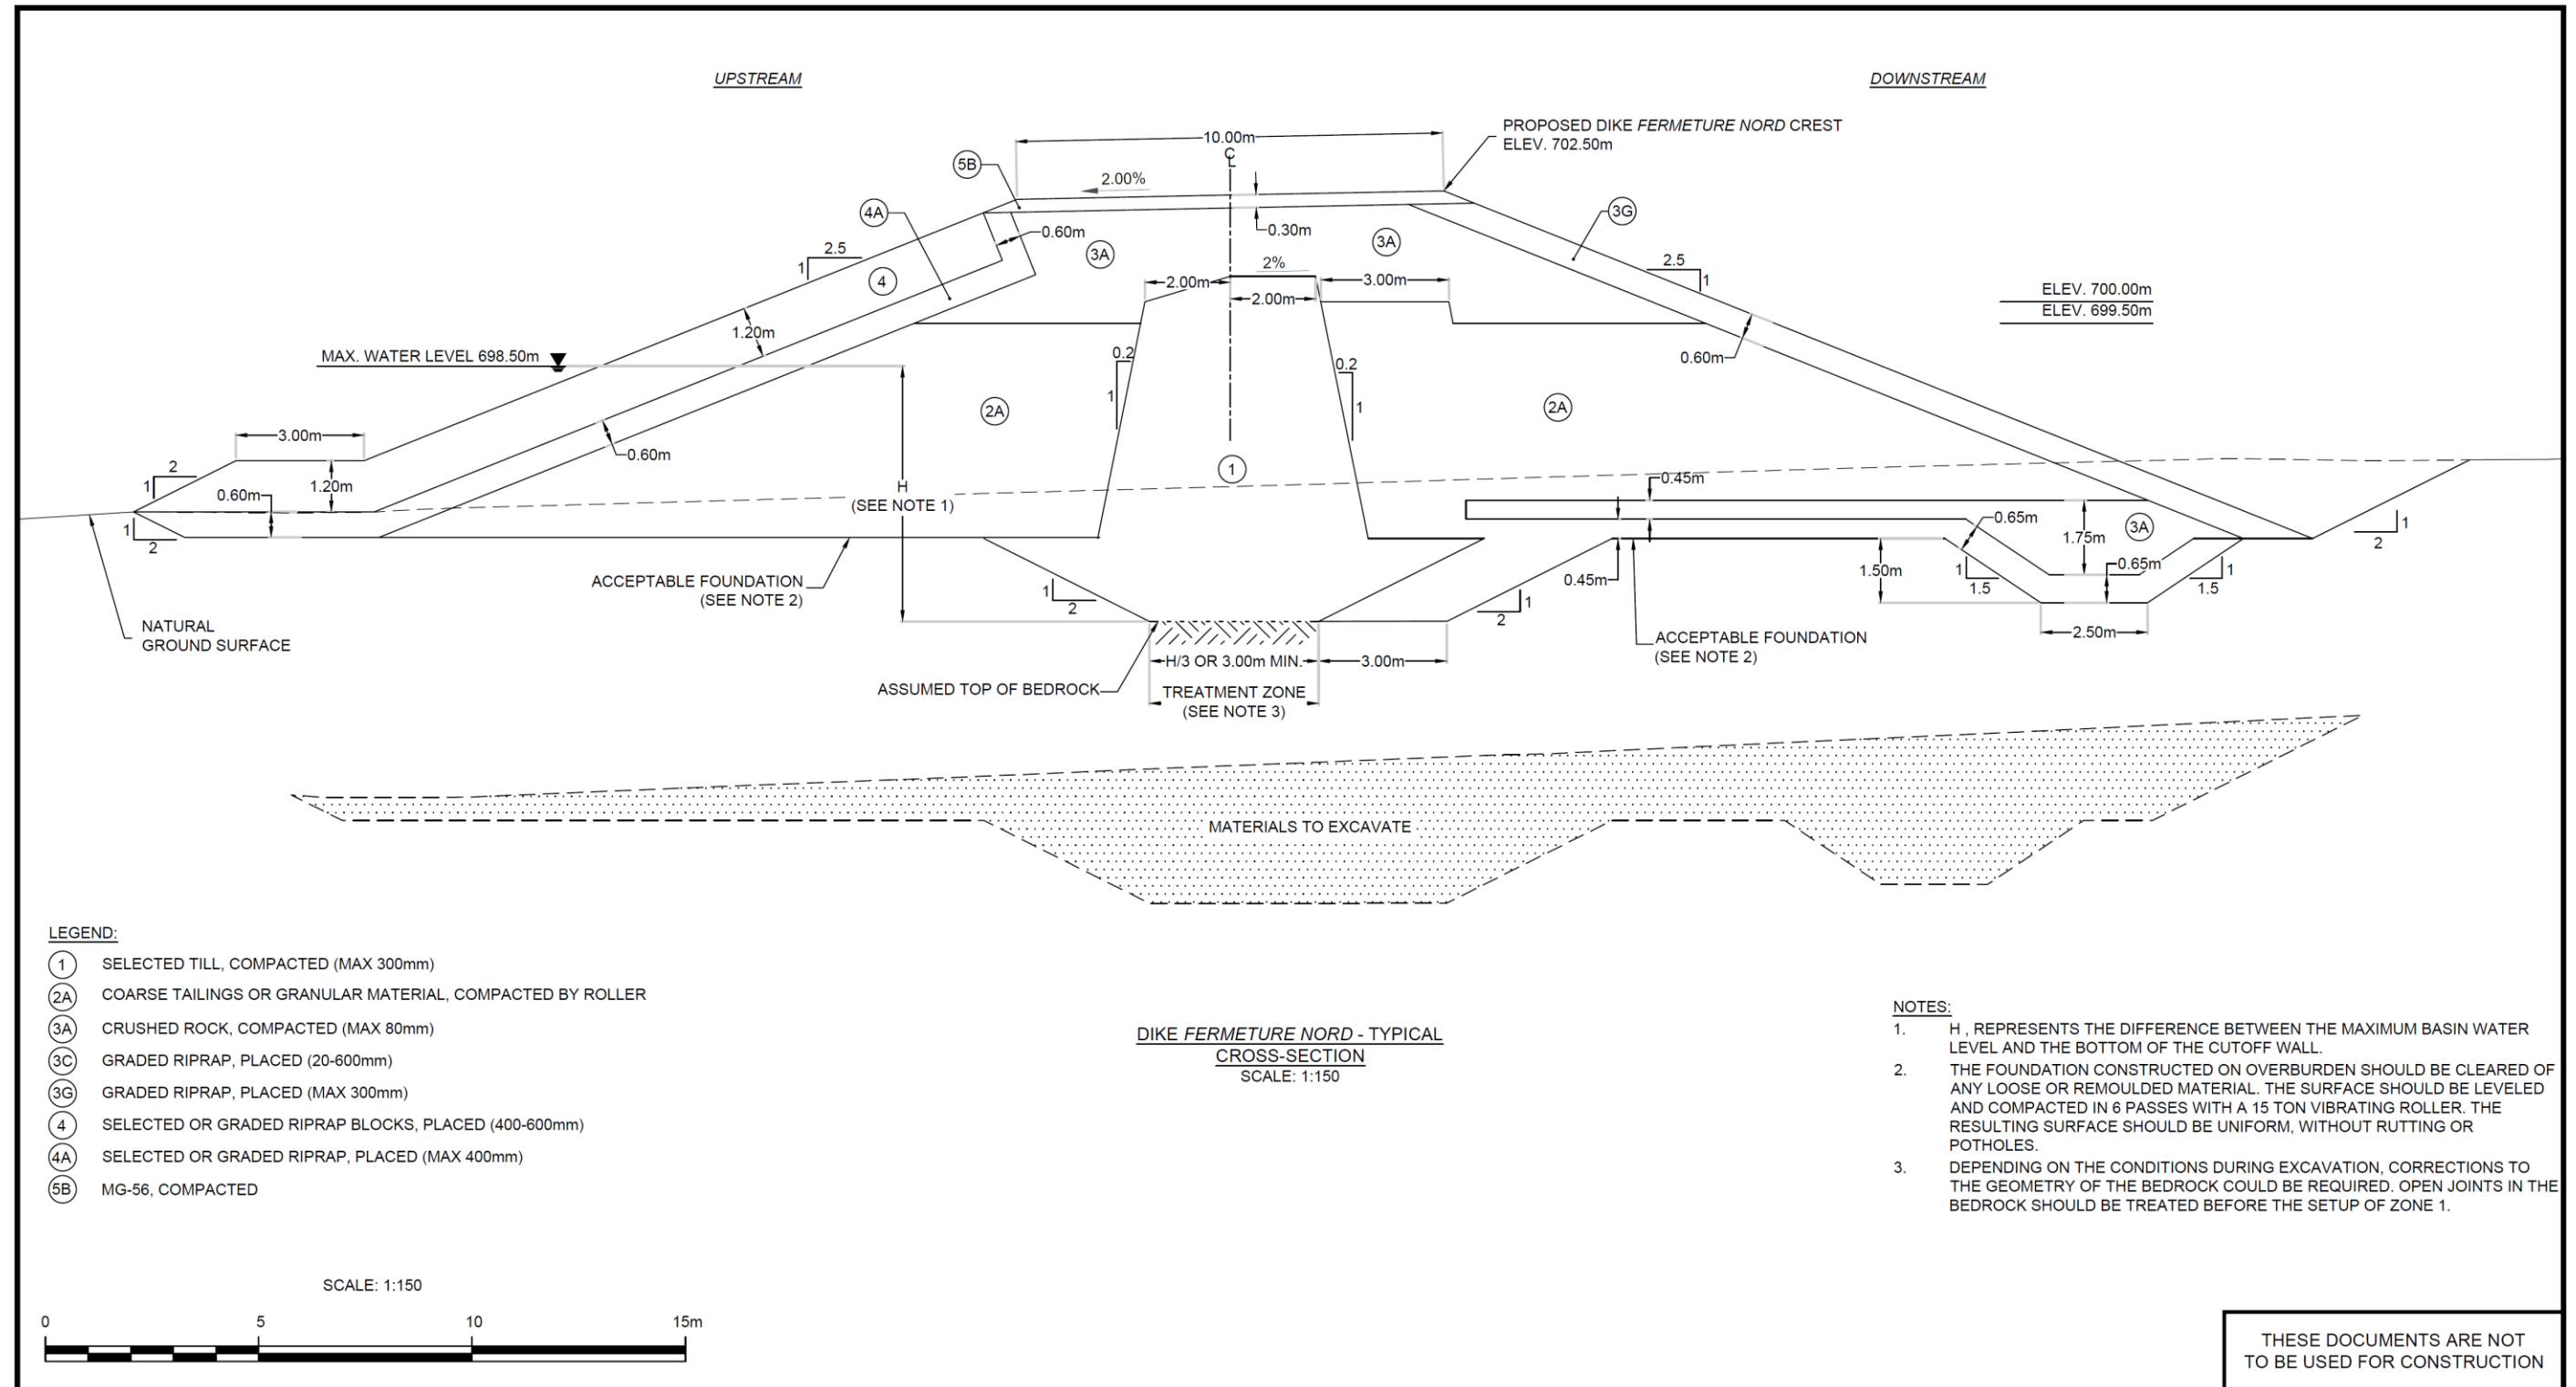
Typical cross-section – Dike Fermeture Nord
